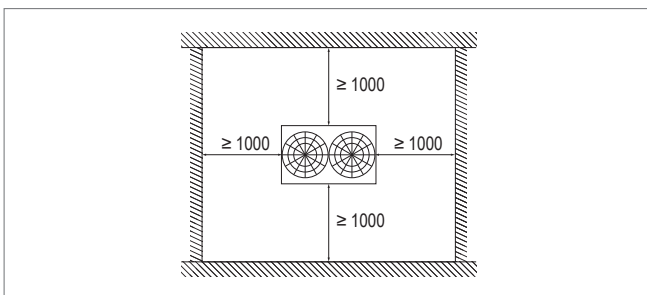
Minimum distances for the heat pump P (dimensions in mm)
